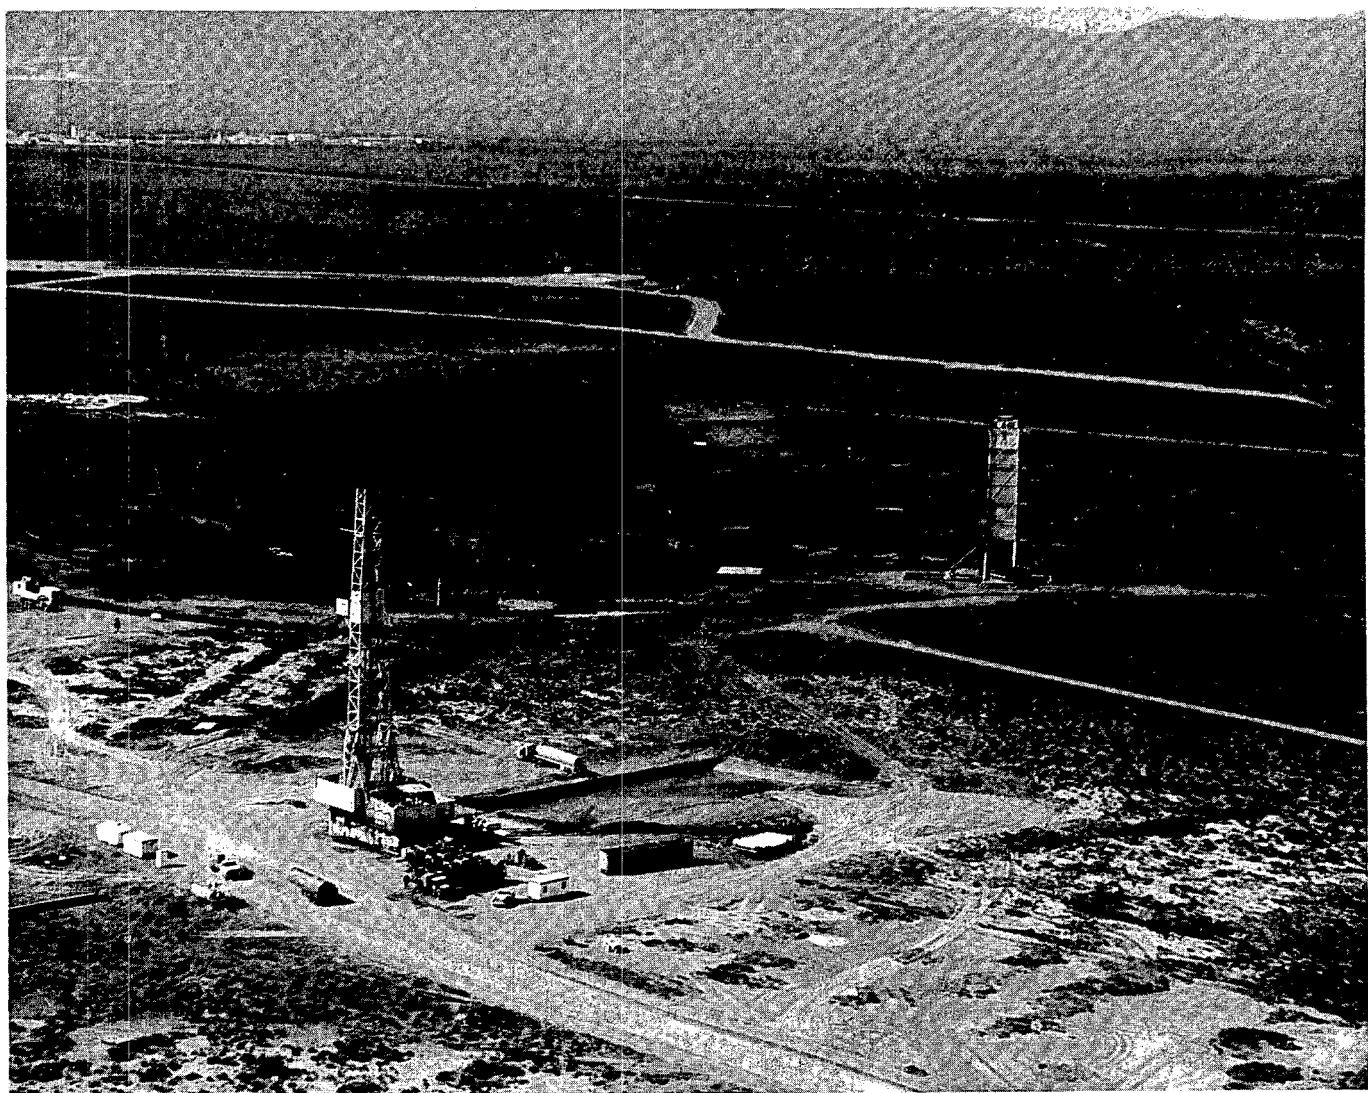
"EMPLACEMENT HOLE DRILLING"
